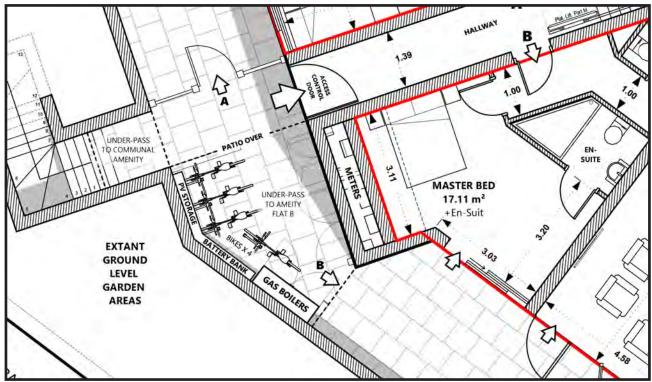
Basement level plan detail, showing rear plant and bike area under the Patio of Flat C.
